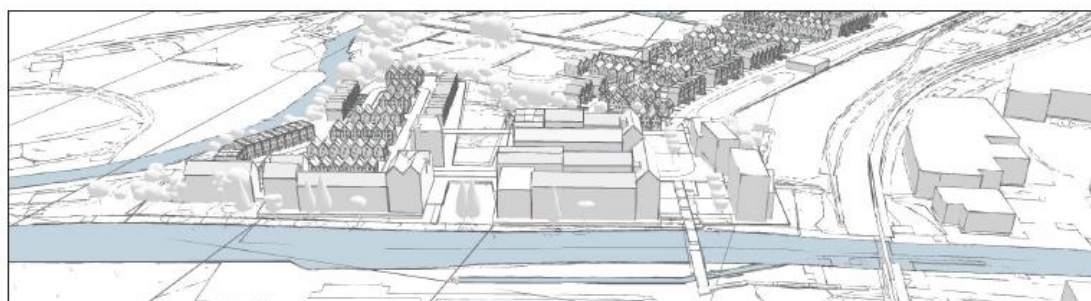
Extract from Massing Plan showing building heights in Wensum Riverside
